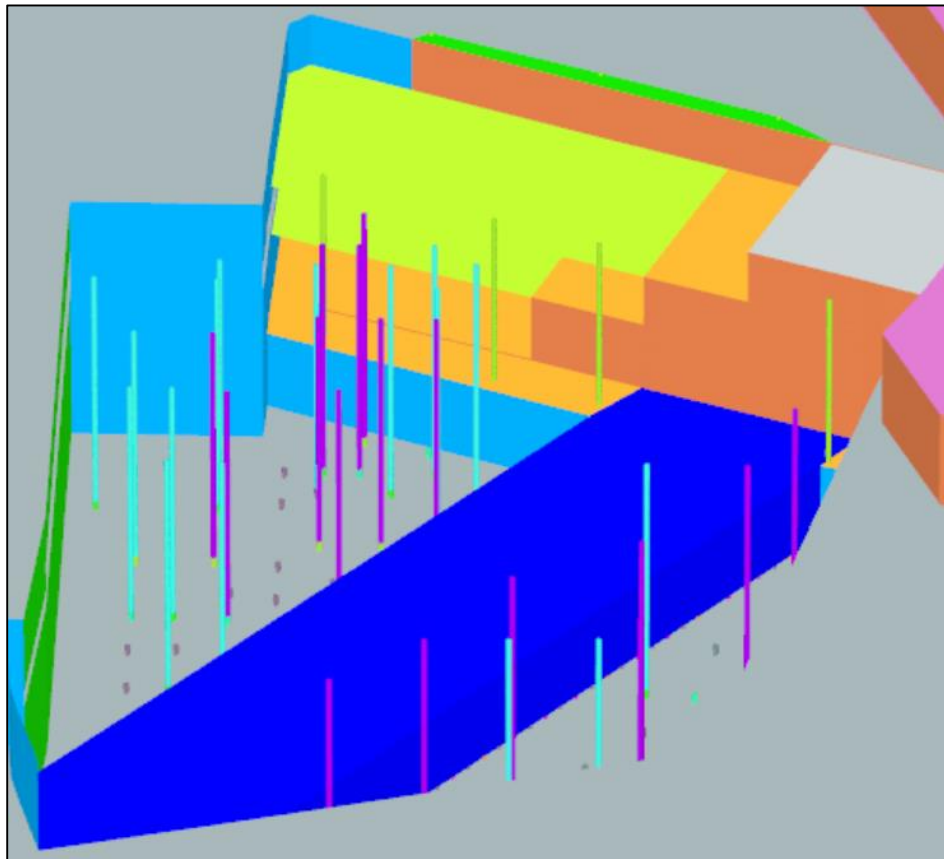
Stage 7 – Excavation to B2 formation level (B1 slabs not shown)
